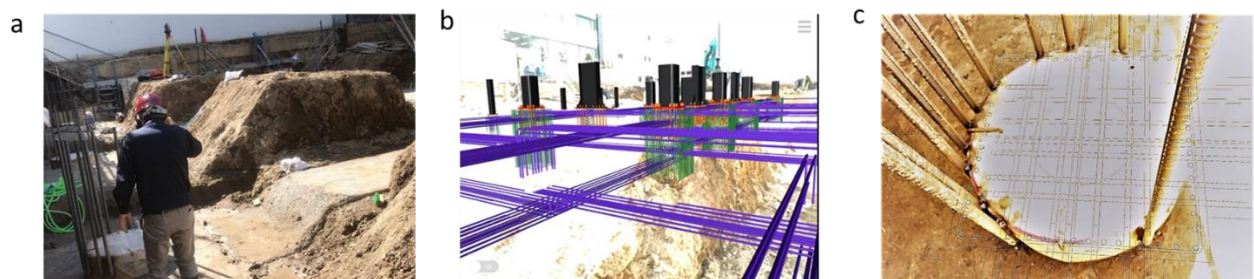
(a). Site before Rebar construction (b). 3D model of Rebar construction (c). 2D model of Rebar construction
